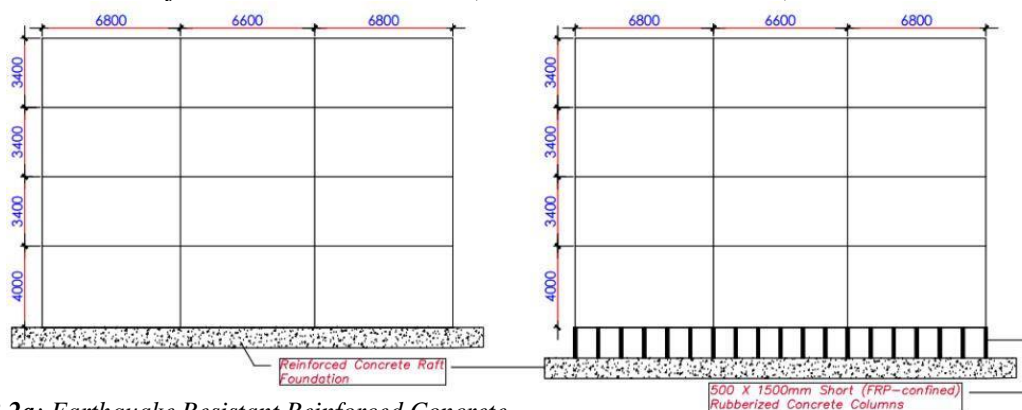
Earthquake Resistant Reinforced Concrete Frame designed to Eurocode 8 (Control Frame)
